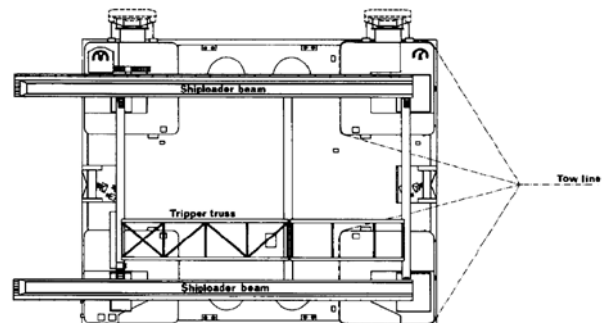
Plan on Berth Caisson (in Final Flotation Arrangement)
